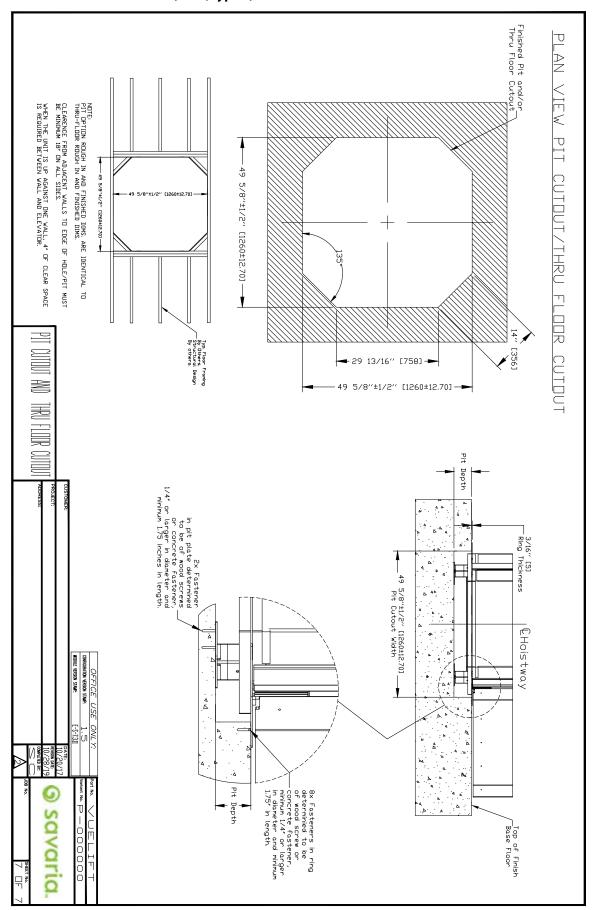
Pit cutout/thru-floor cutout (OAM, type 1)
